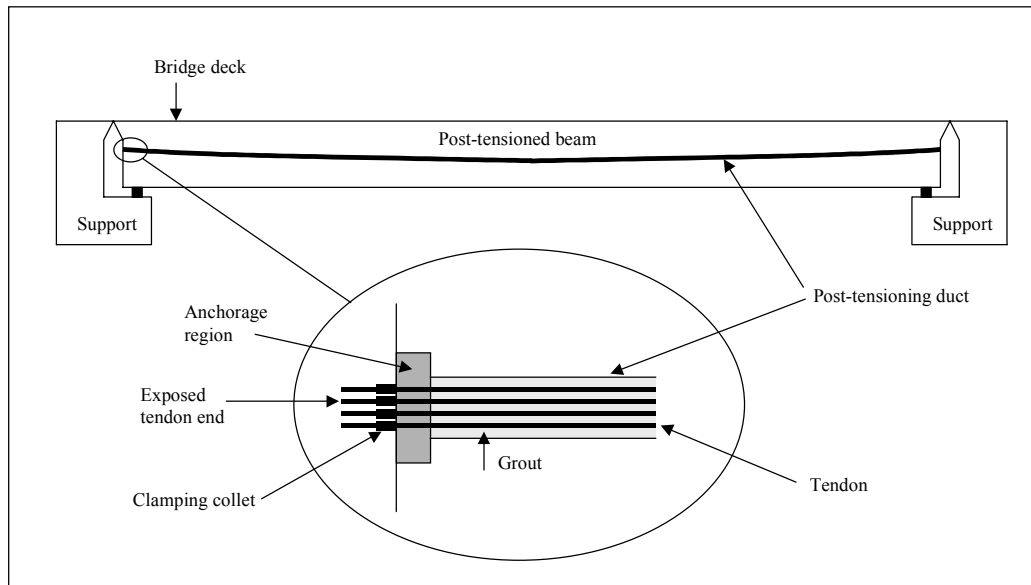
Typical post-tensioning construction arrangement in a bridge deck.
